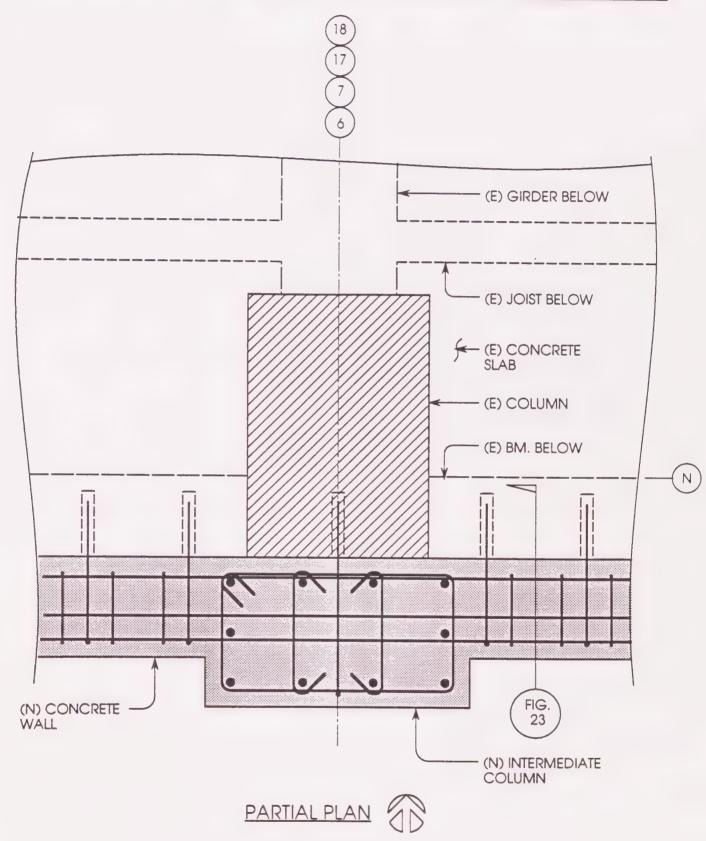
Retrofit Scheme - Typical Intermediate Column at Tower
